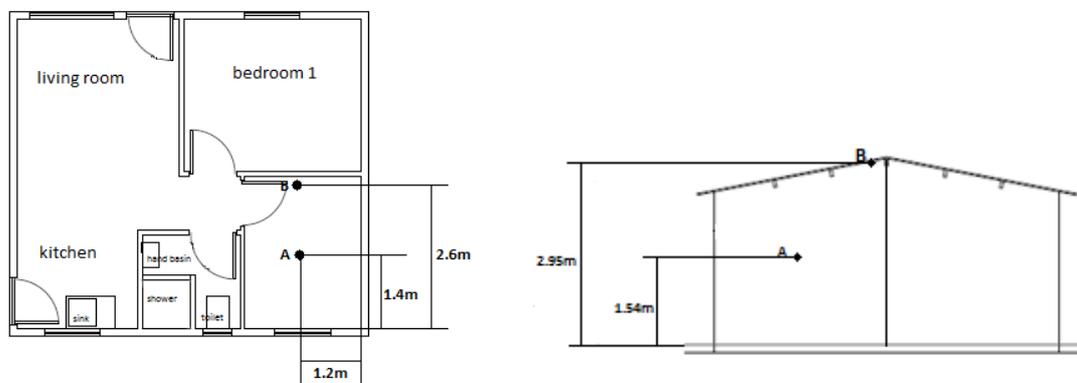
Measuring points A and B in plan view (left) and elevation (right)
